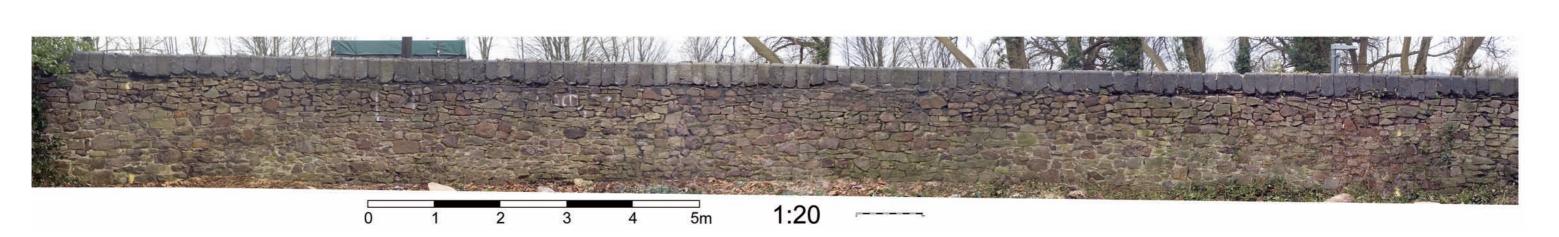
Rectified photograph of south elevation of wall, from the south, scale as indicated (Cotters Photography)
